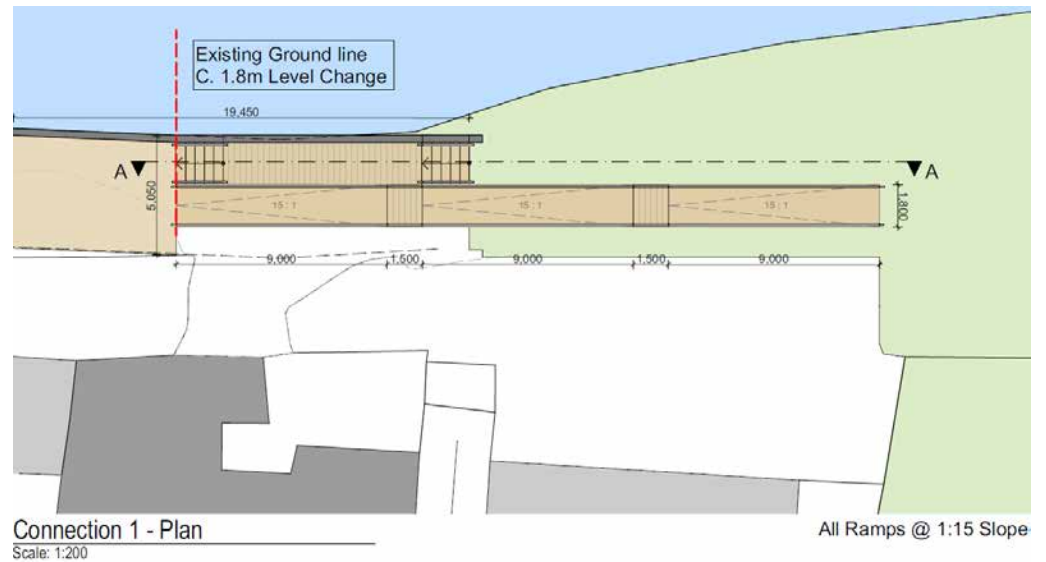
Refer to Appendix 7.7 possible intervention plan
